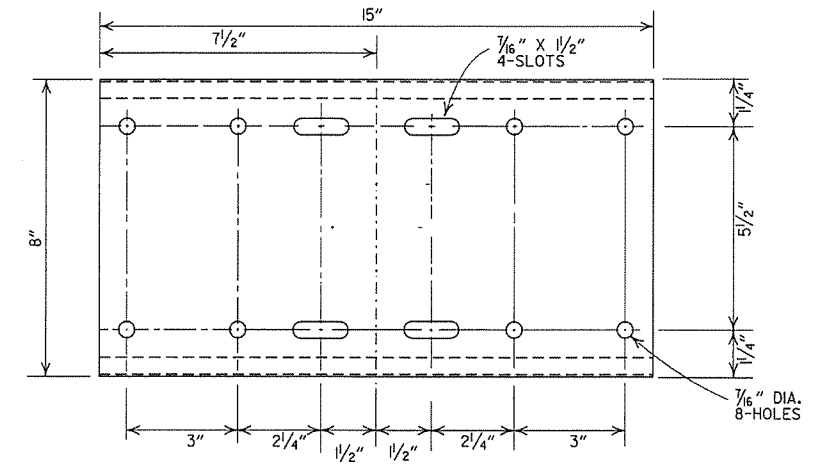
DETAIL OF TERMINAL ANCHOR POST (TYPE I)
